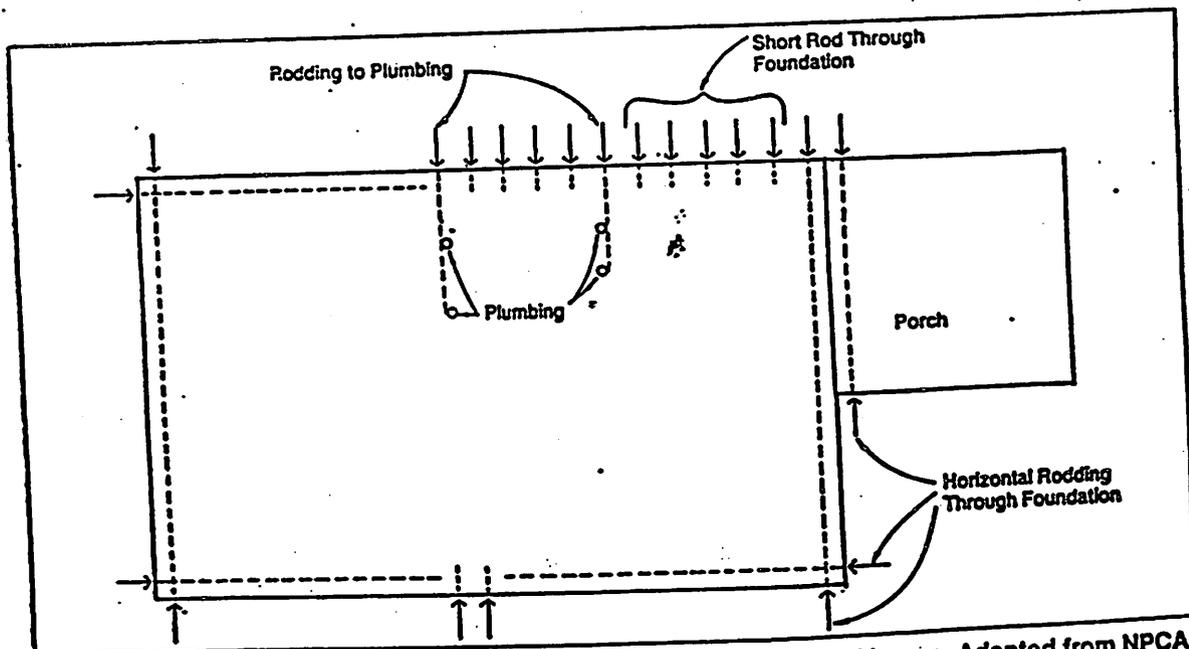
A plan for long- and short-rodding under a slab-on-ground house. Adapted from NPCA.
